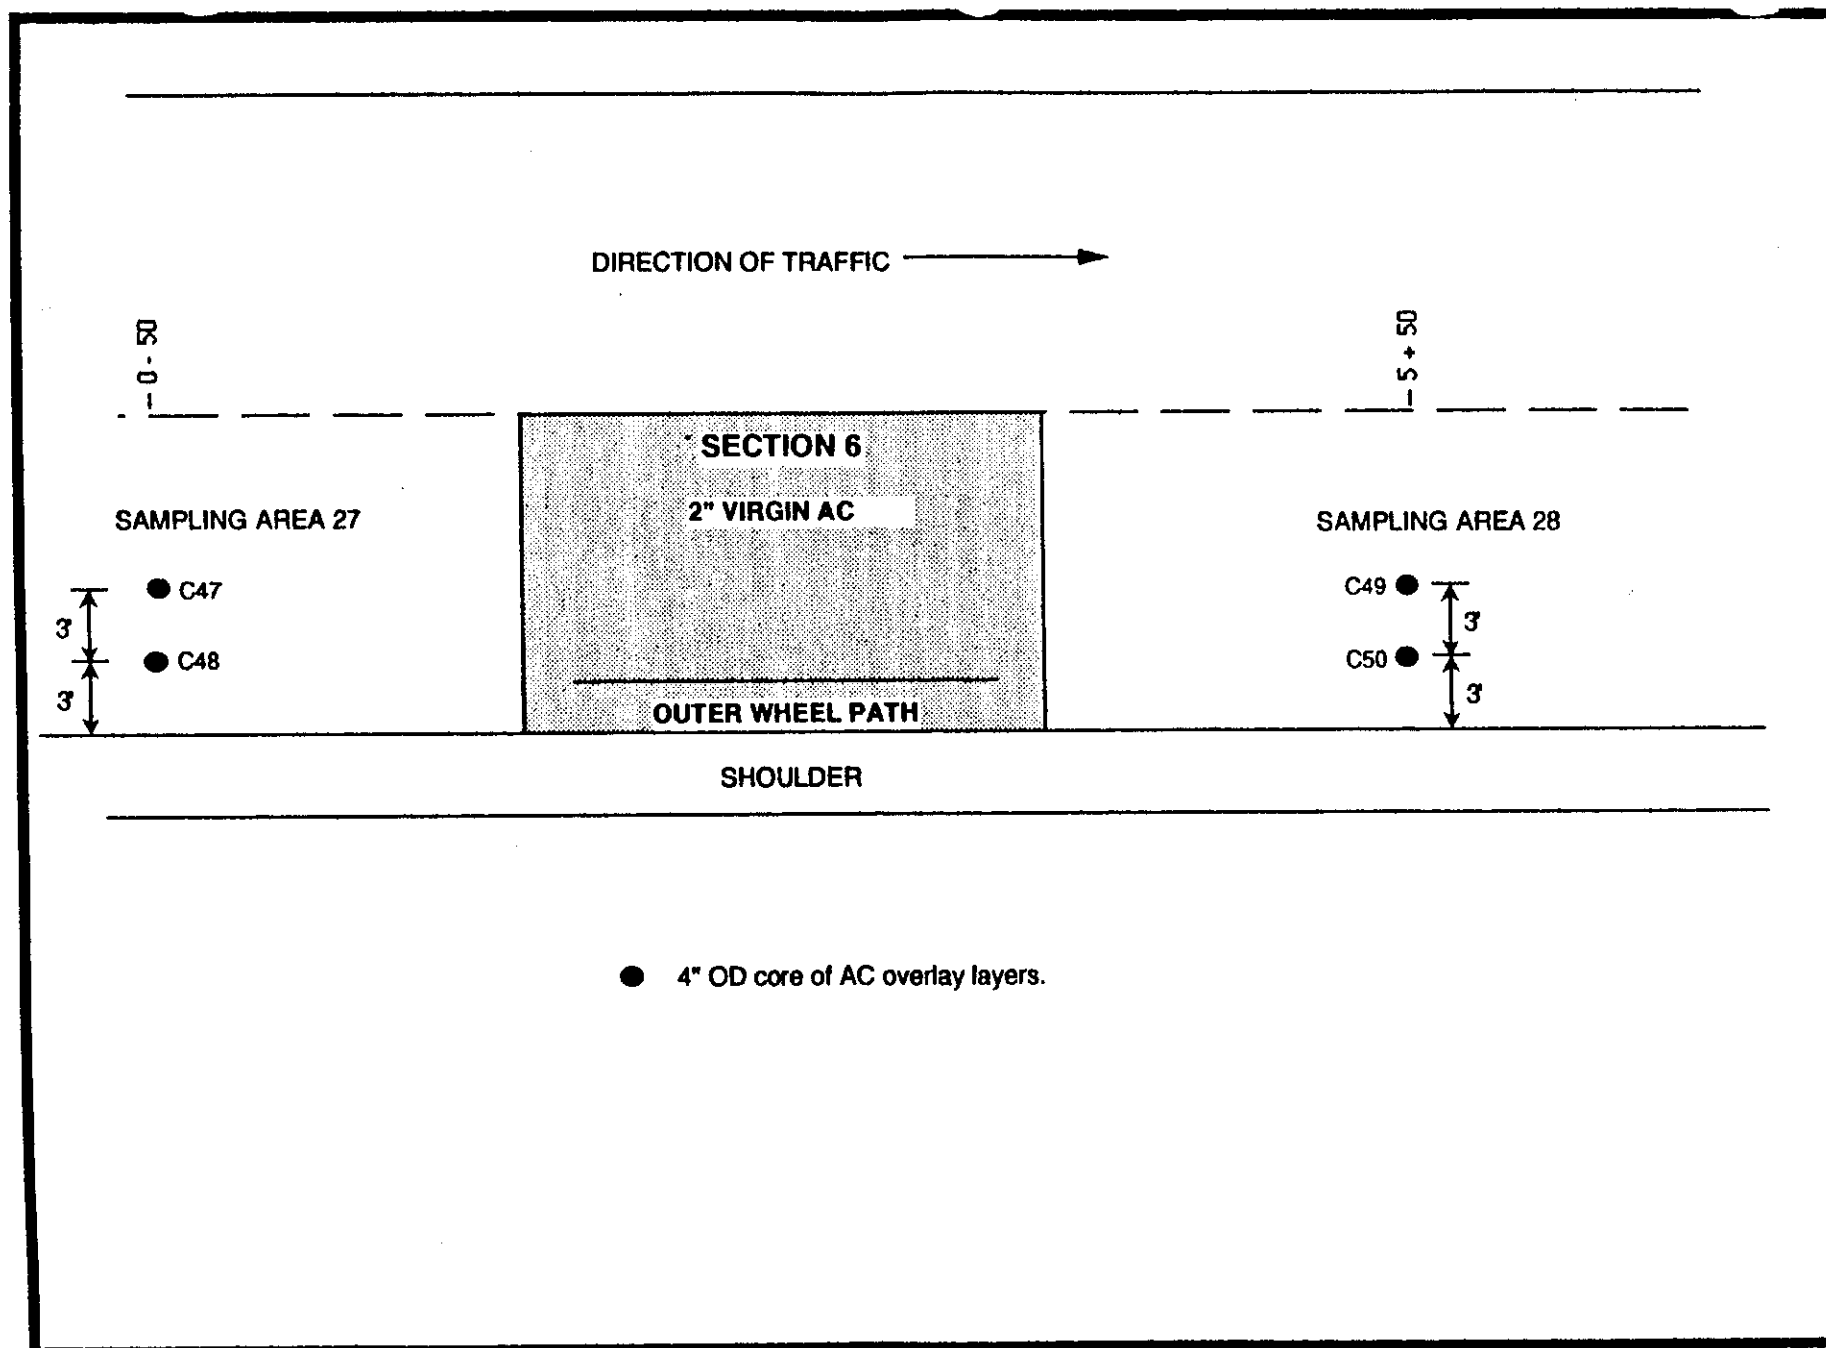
Example of "Post-Construction" Sampling Plan for Section 6.
